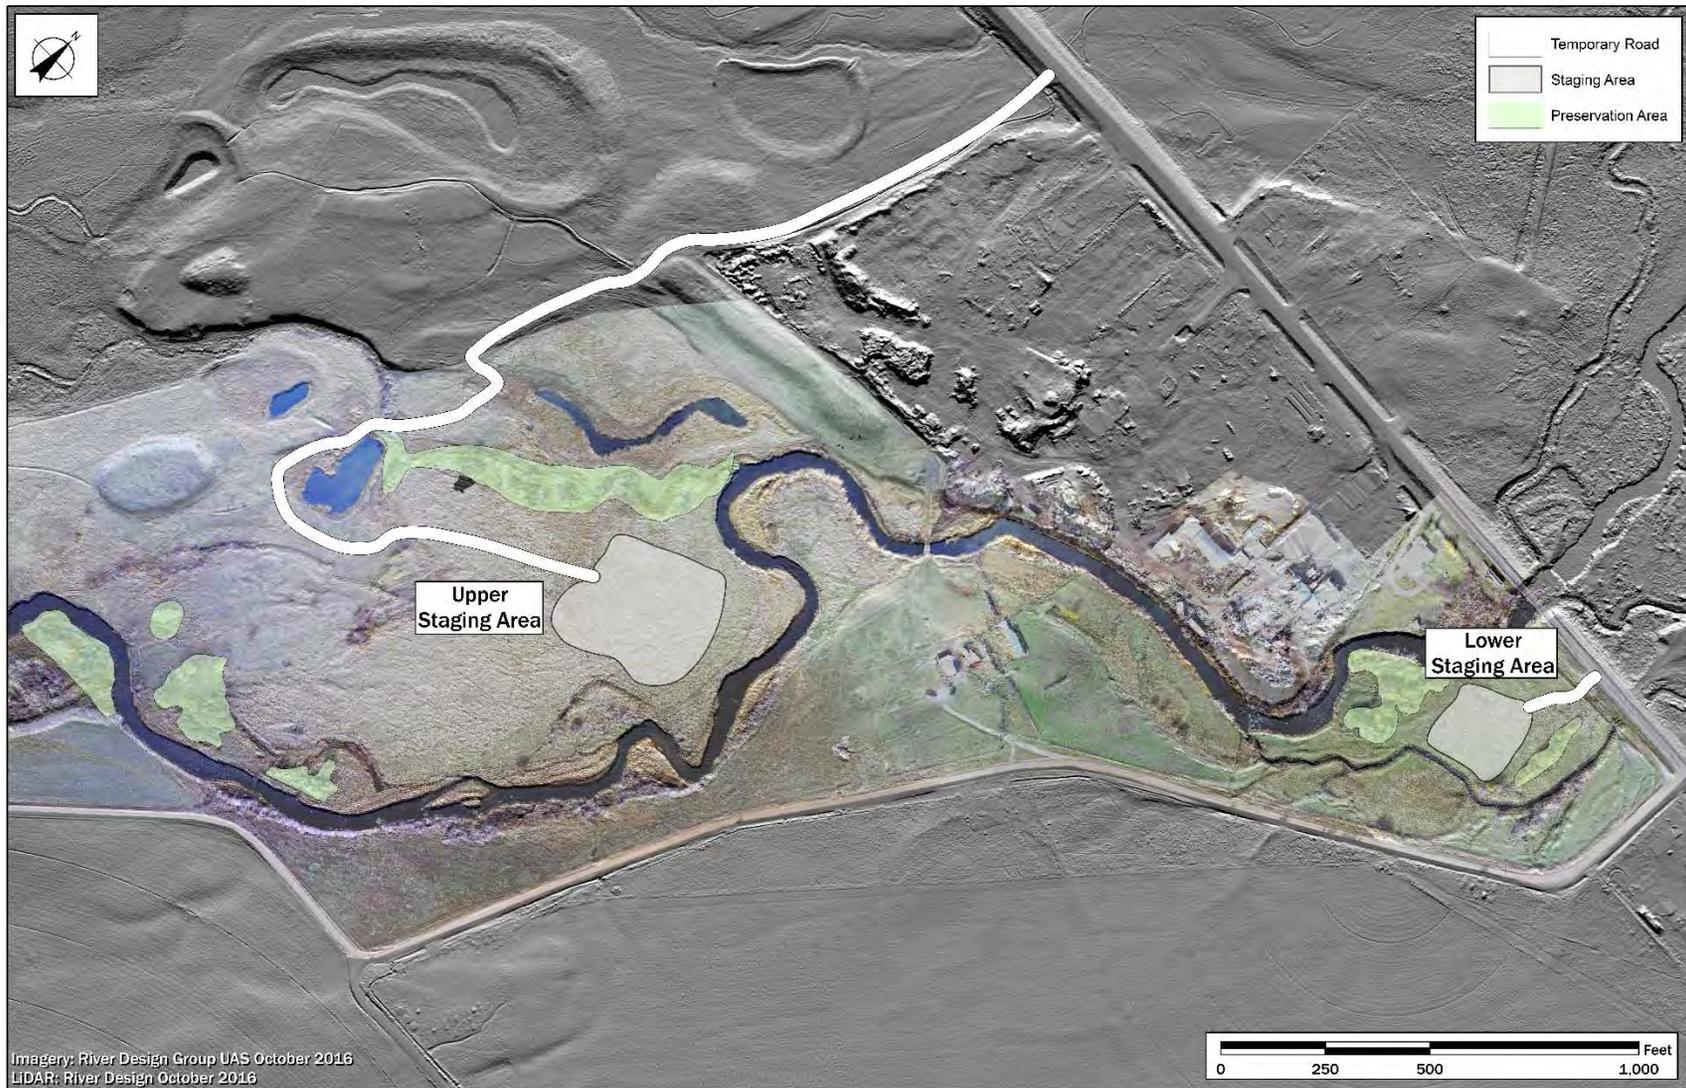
Staging areas and access roads for proposed construction efforts.
